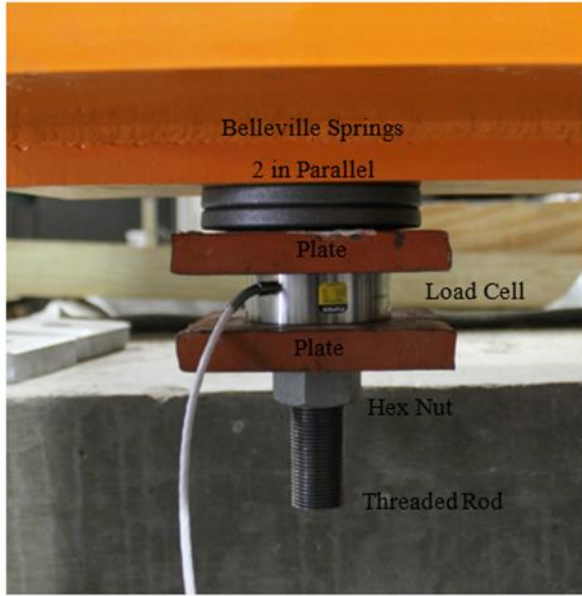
Outer Ends of Specimen Installed in Testing Frame
